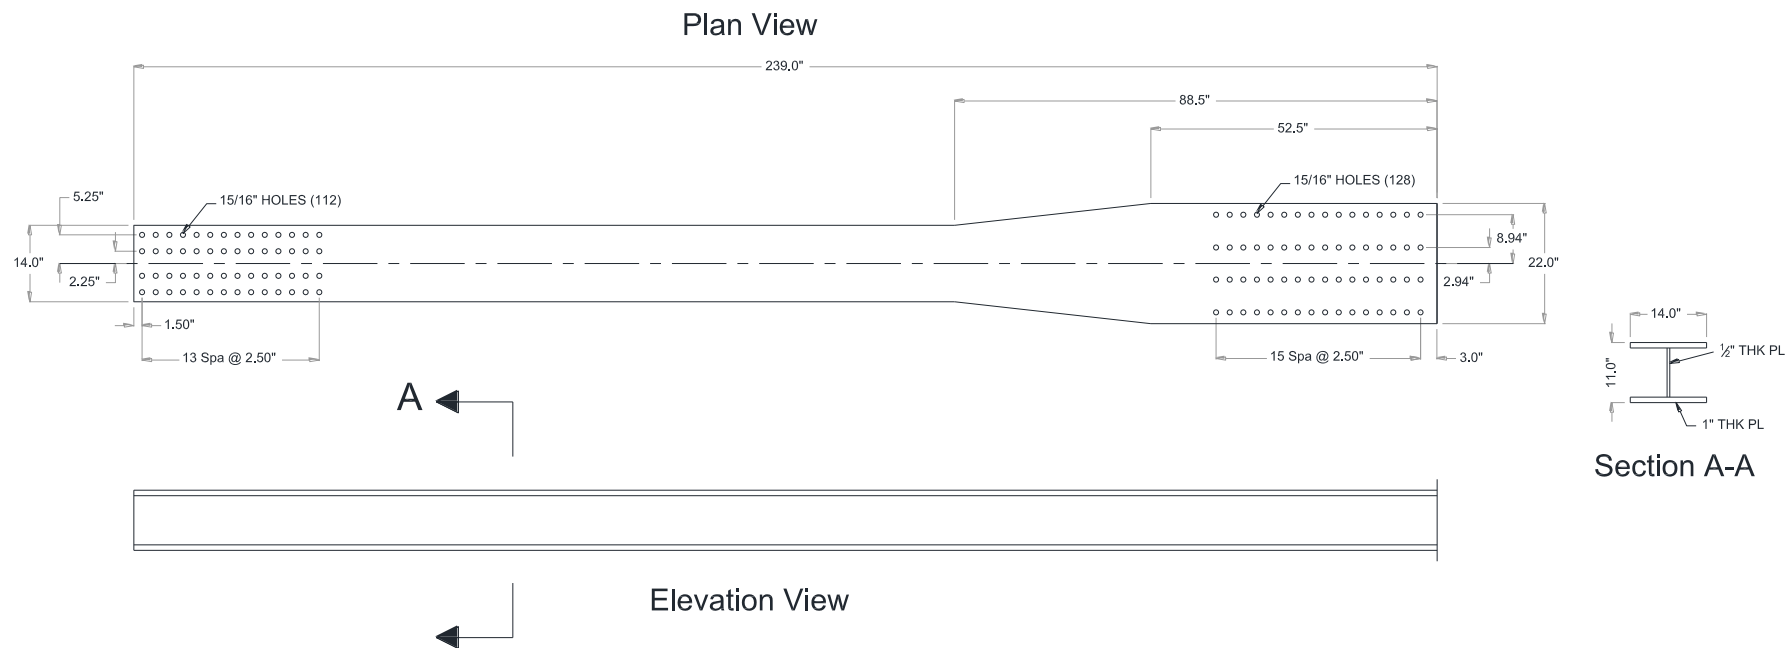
East chord plan/elevation views and cross-section properties
